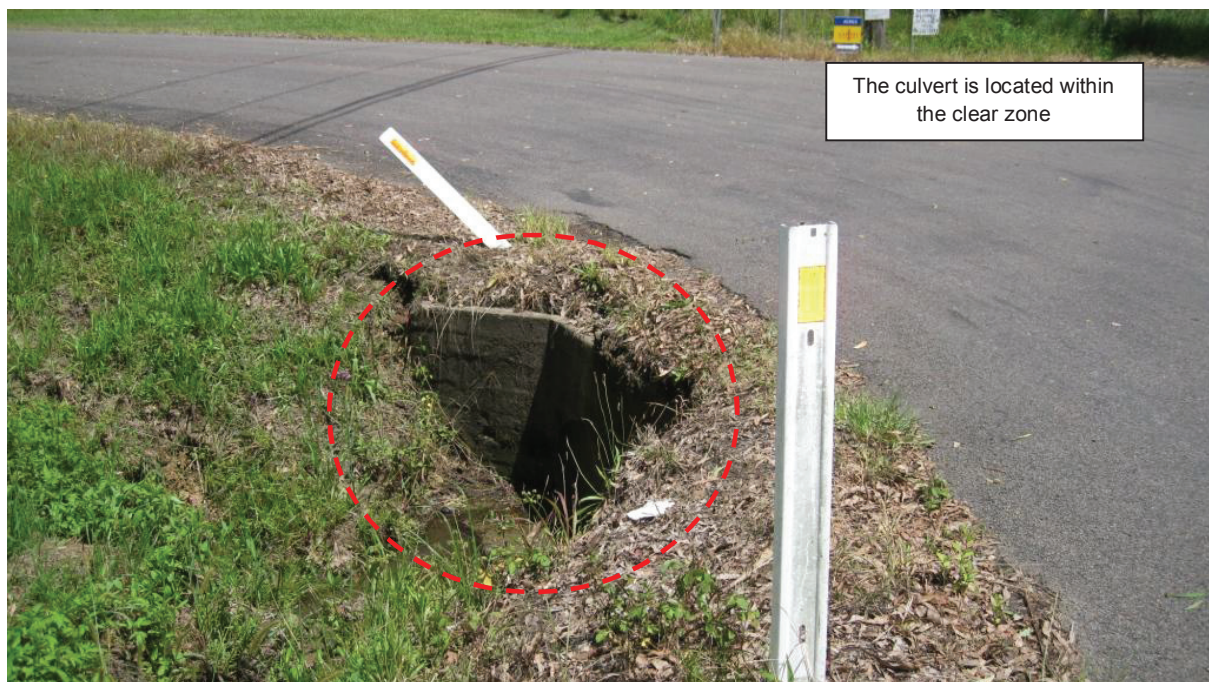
Jilliby Road, looking east toward its intersection with Little Jilliby Road
